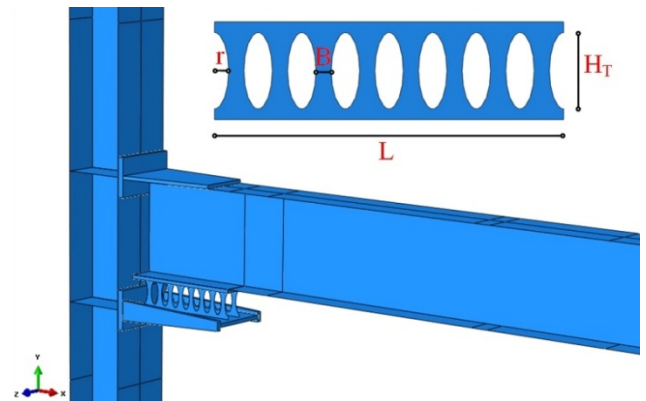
Modeling of beam-to-column connection equipped with elliptic slit dampers
